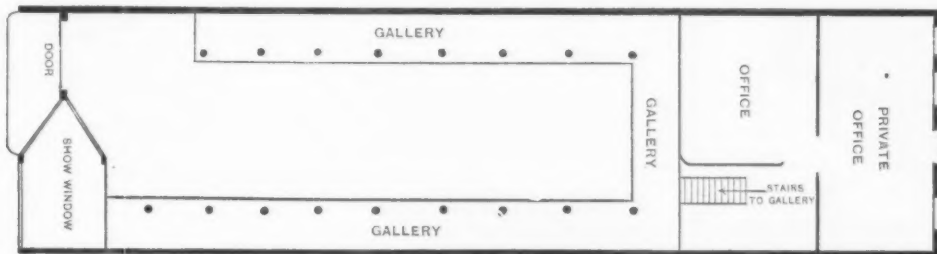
Plan Showing Arrangement of Gallery, Office, &c.
